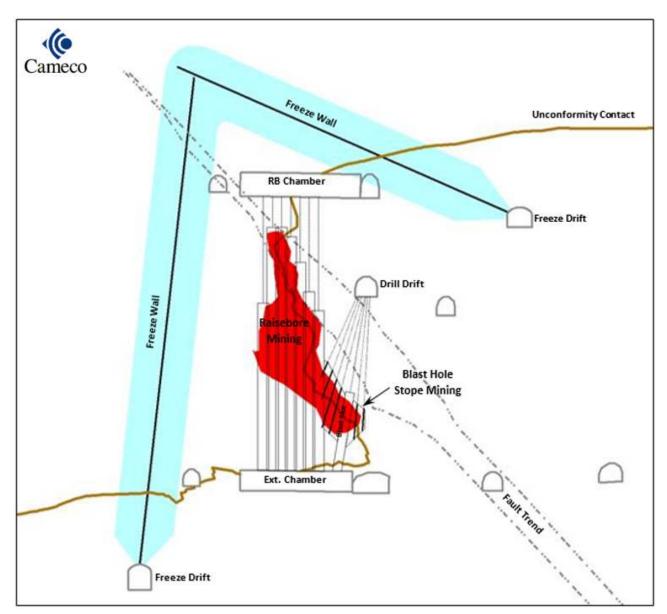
Section Schematic looking North (Mine Grid) of Zone B showing Typical Freeze Wall and Ore Extraction Methods
